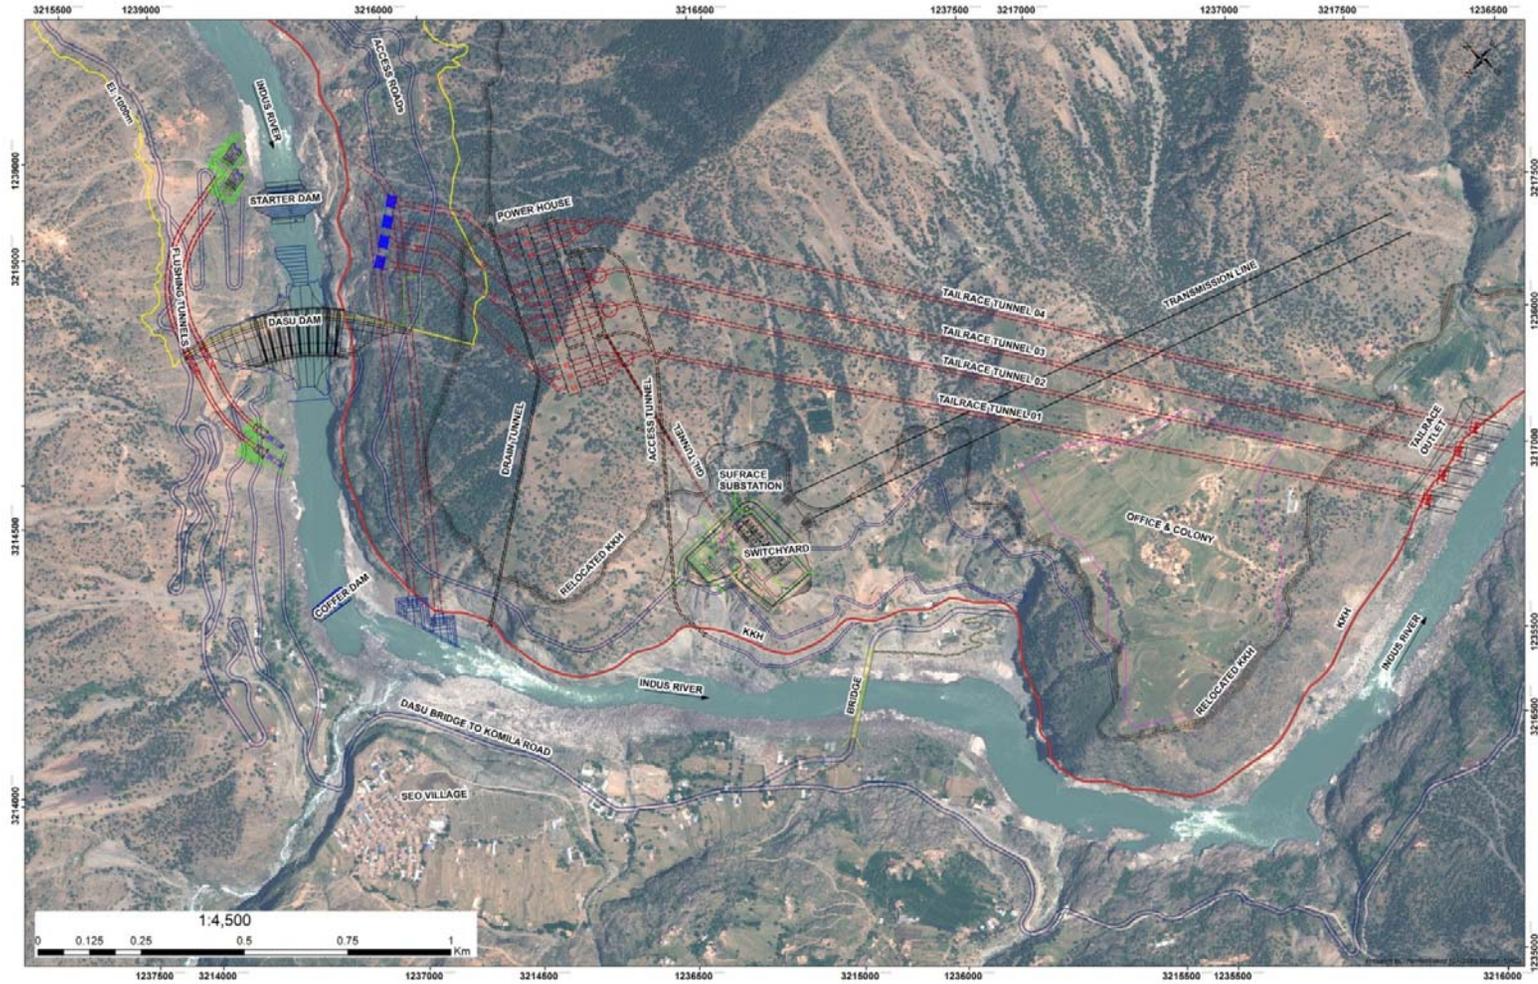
Layout Plan of Project Facilities marked on Satellite Imagery
